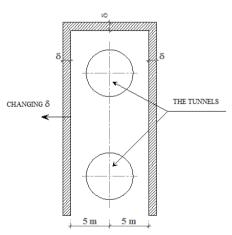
The sub-soil reinforced by Jet Grouting at the cross-section at the Opera House (URMB 2010)
